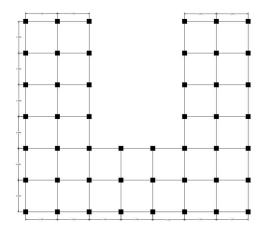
Building Plan-U Configuration without shearwall (V0)
